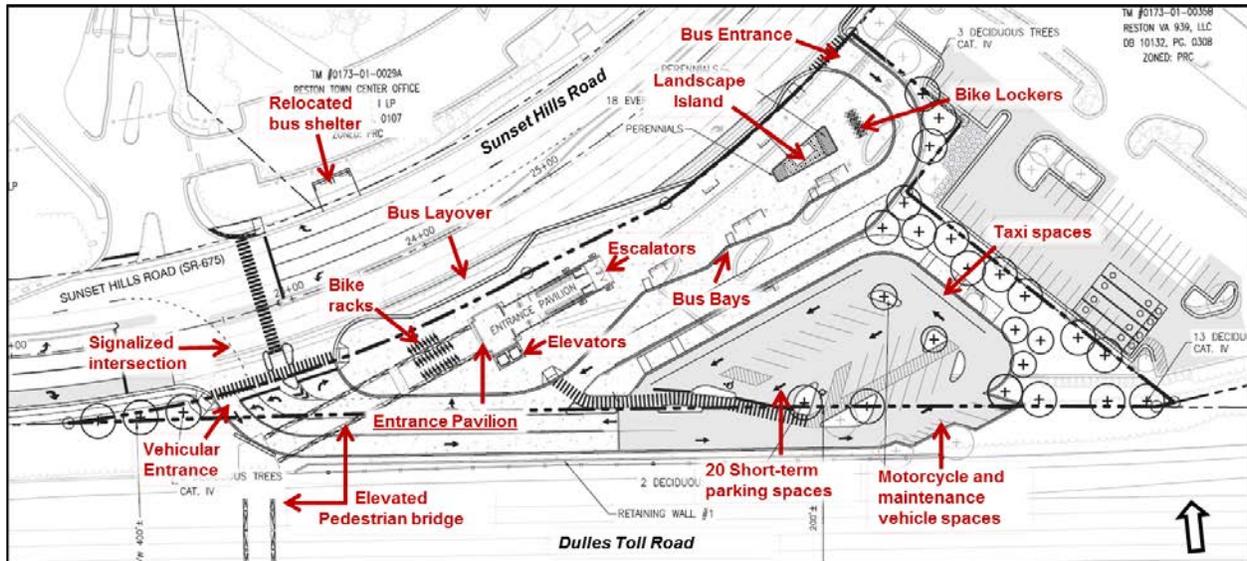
Site Layout, Source: SE Plat/ PRC Plan/Public Facilities Plan, Sheet 5
